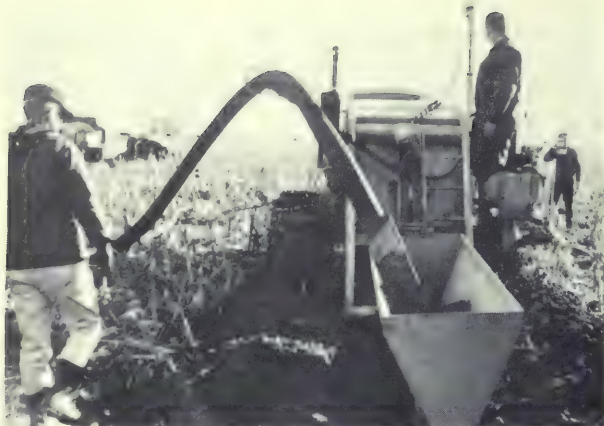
Hose "Gigant" trencher and pipe-laying machine placing drainage tubing through gravel hopper and shield in trench.
